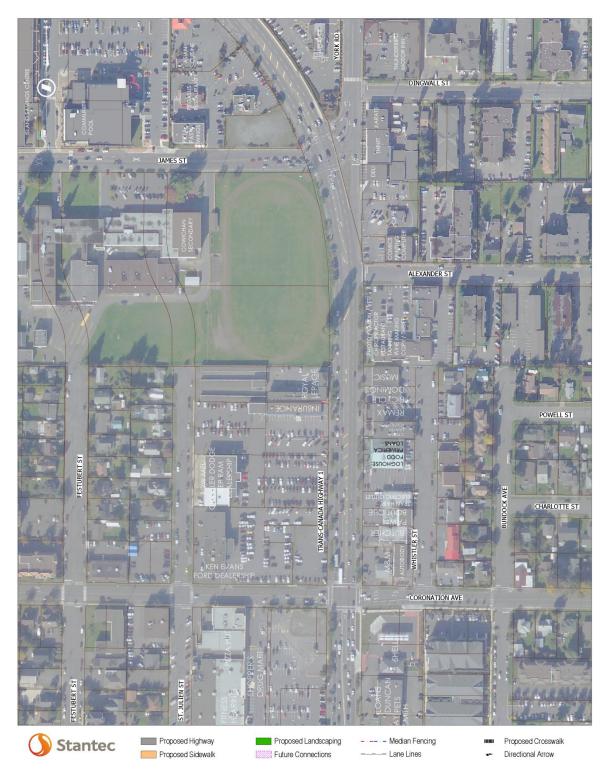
Existing Condition–Trunk Road to James Street/York Road
